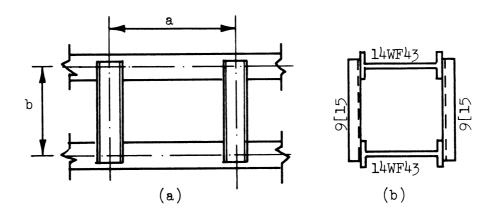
(2). The battened structural member 1-2; (a) geometrical arrangement and (b) cross-section.
